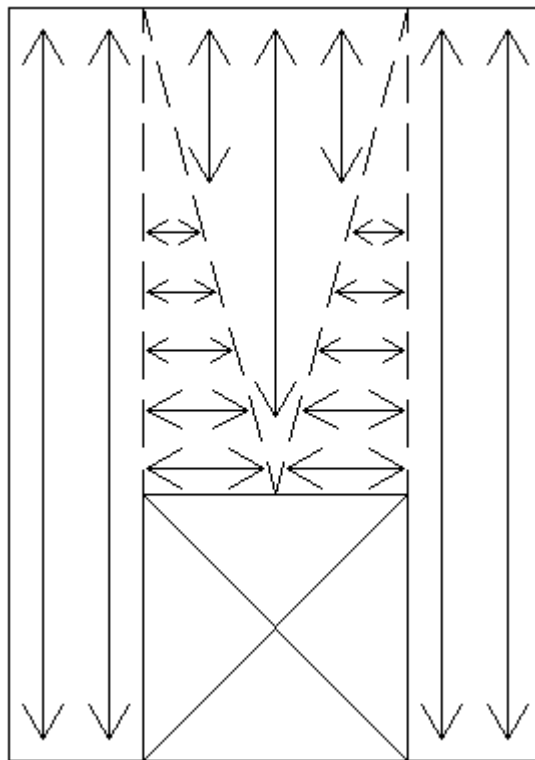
Out-of-Plane Two-Way-Bending Load Path for Tilt-up Panels
